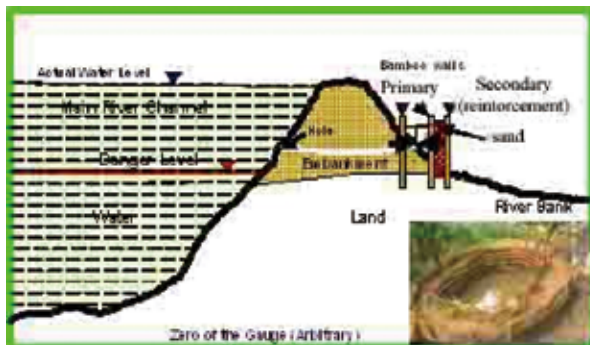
Cross Section of dyke and Yaing Khway, or “small well”
